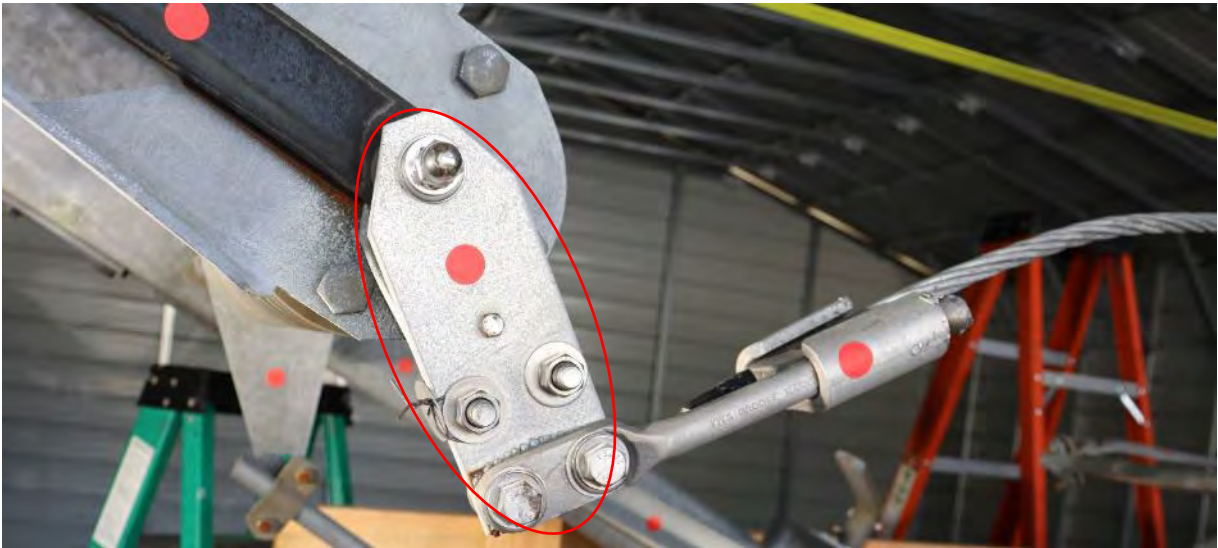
Jumper connector pad which connects the lower jumper to lower phase of Switch 49.⁶²
